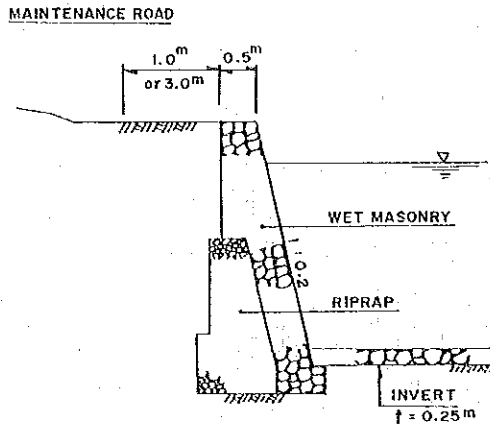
(2/2) STANDARD DRAWING OF RIVER CROSS SECTION
